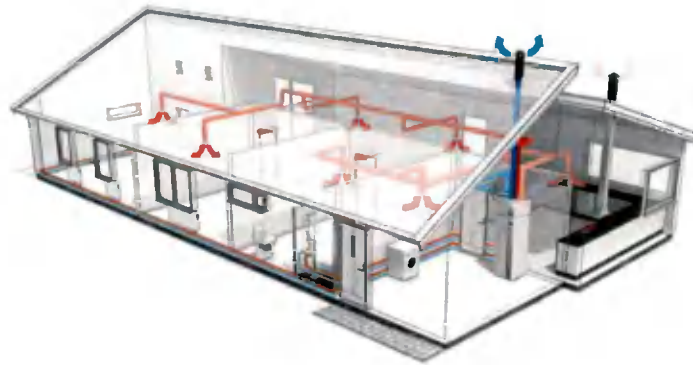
Typical Exhaust Air Heat Pump Installation
